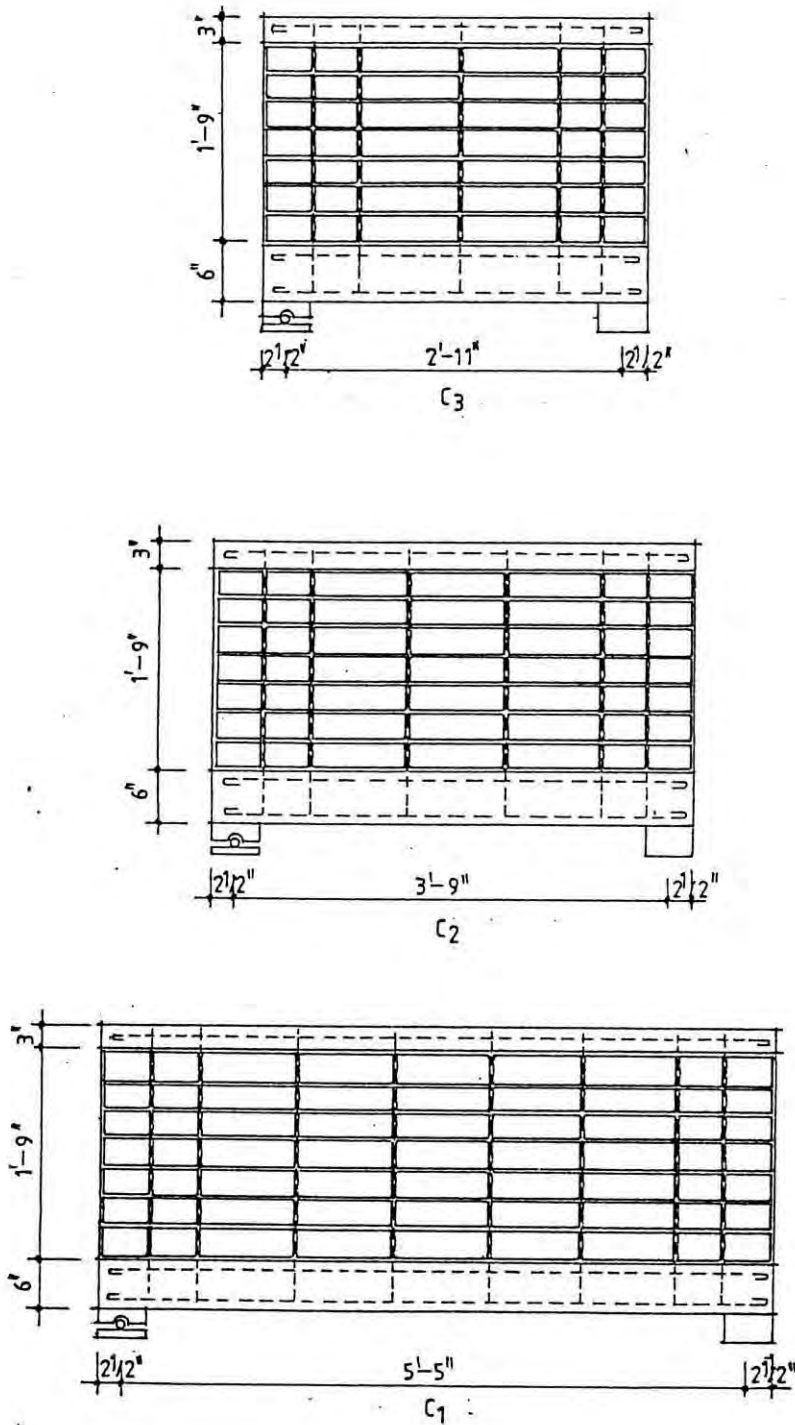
Stack Bonded Composite Wall-Beam Structure With Vertical Reinforcement in Wall Group C
